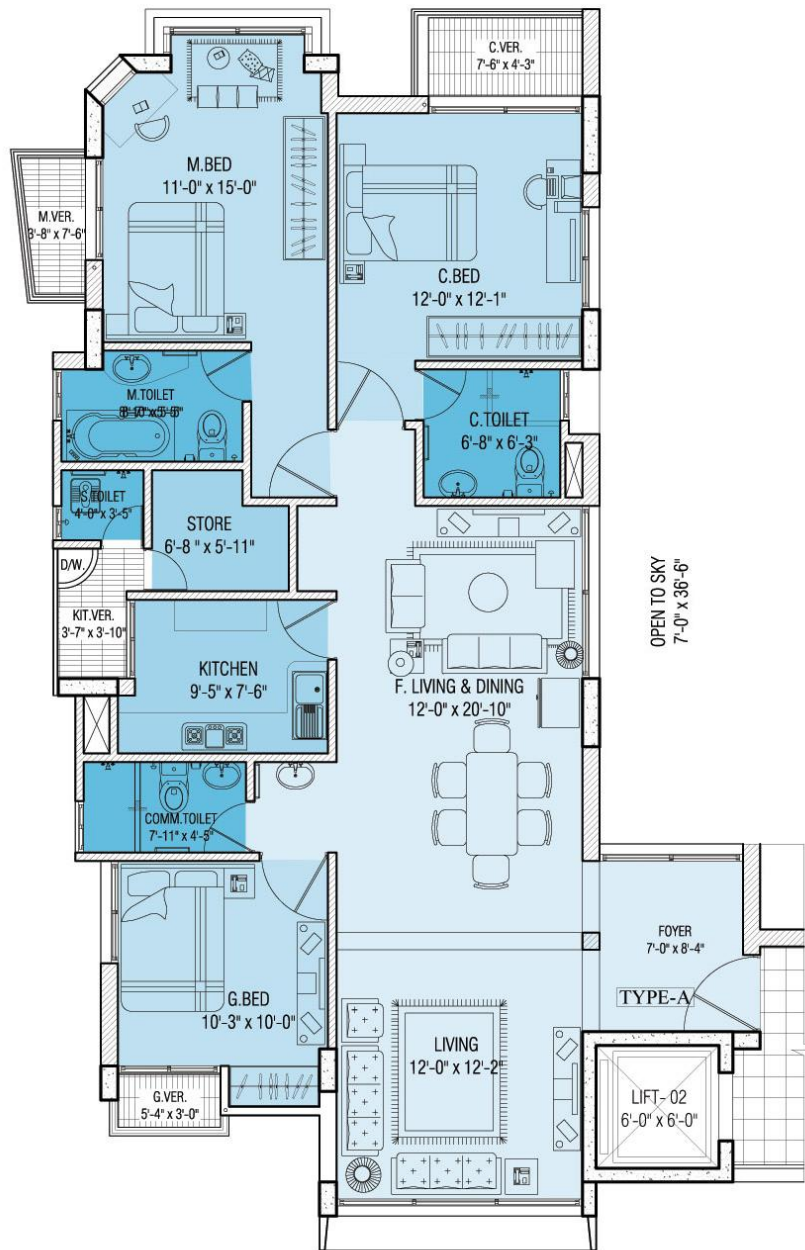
Typical floor plan for showing the orientation, (BrainTrain, 2013).
